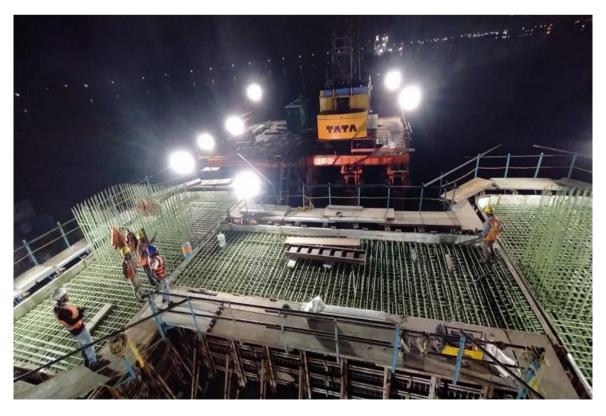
MP 93 Pile Cap Pre-pour Inspection- Marine Area
